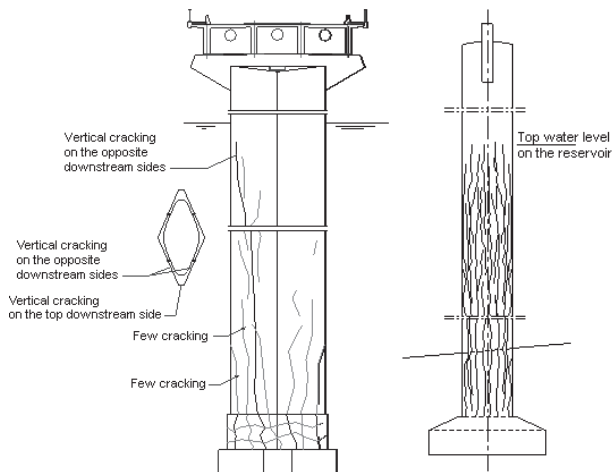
Cracking observed on Foz Dão Bridge piers [1]
